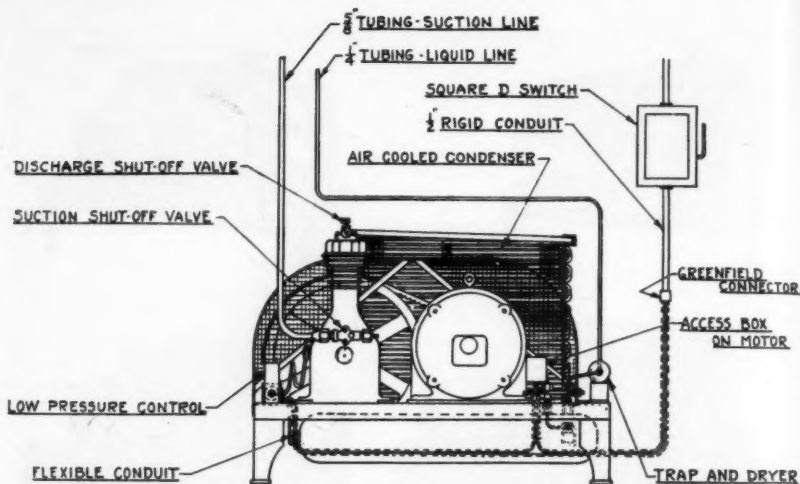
TYPICAL AIR COOLED INSTALLATION
